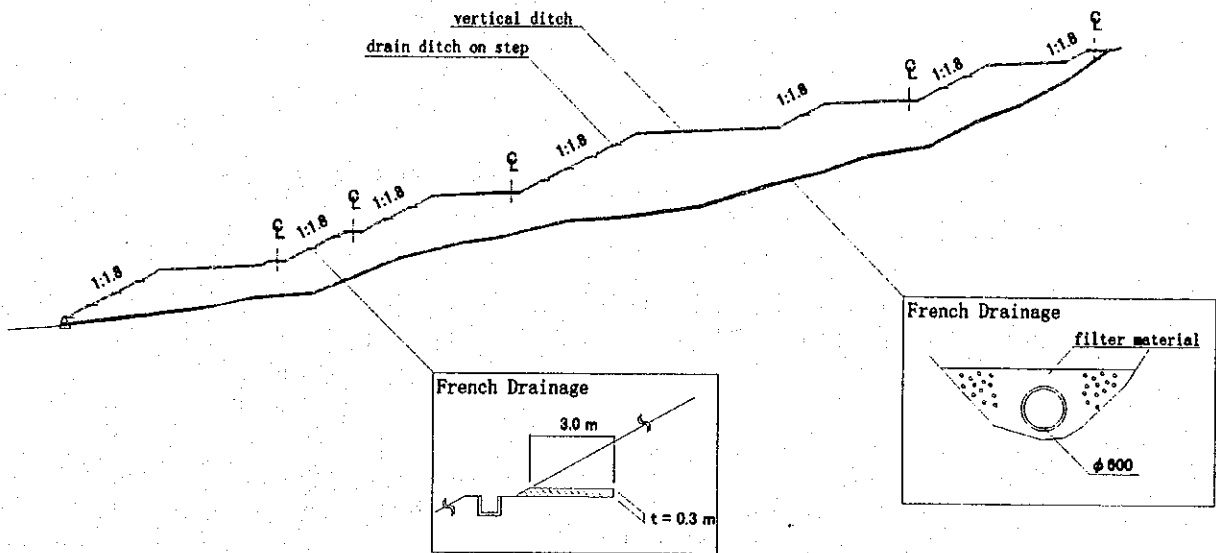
Subsurface Drains to be installed in the High Embankment
